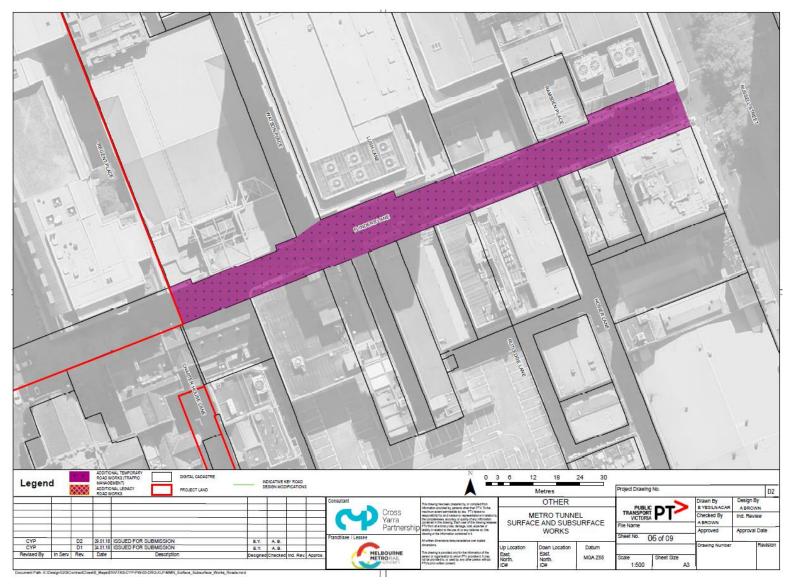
FLINERS LANE ADDITIONAL ROAD SURFACE WORKS
